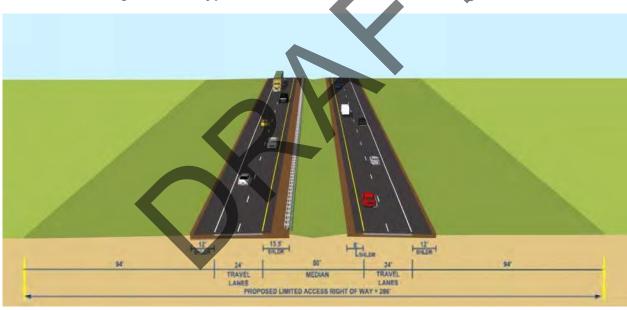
Typical Section - Alternative 2: New Alignment
